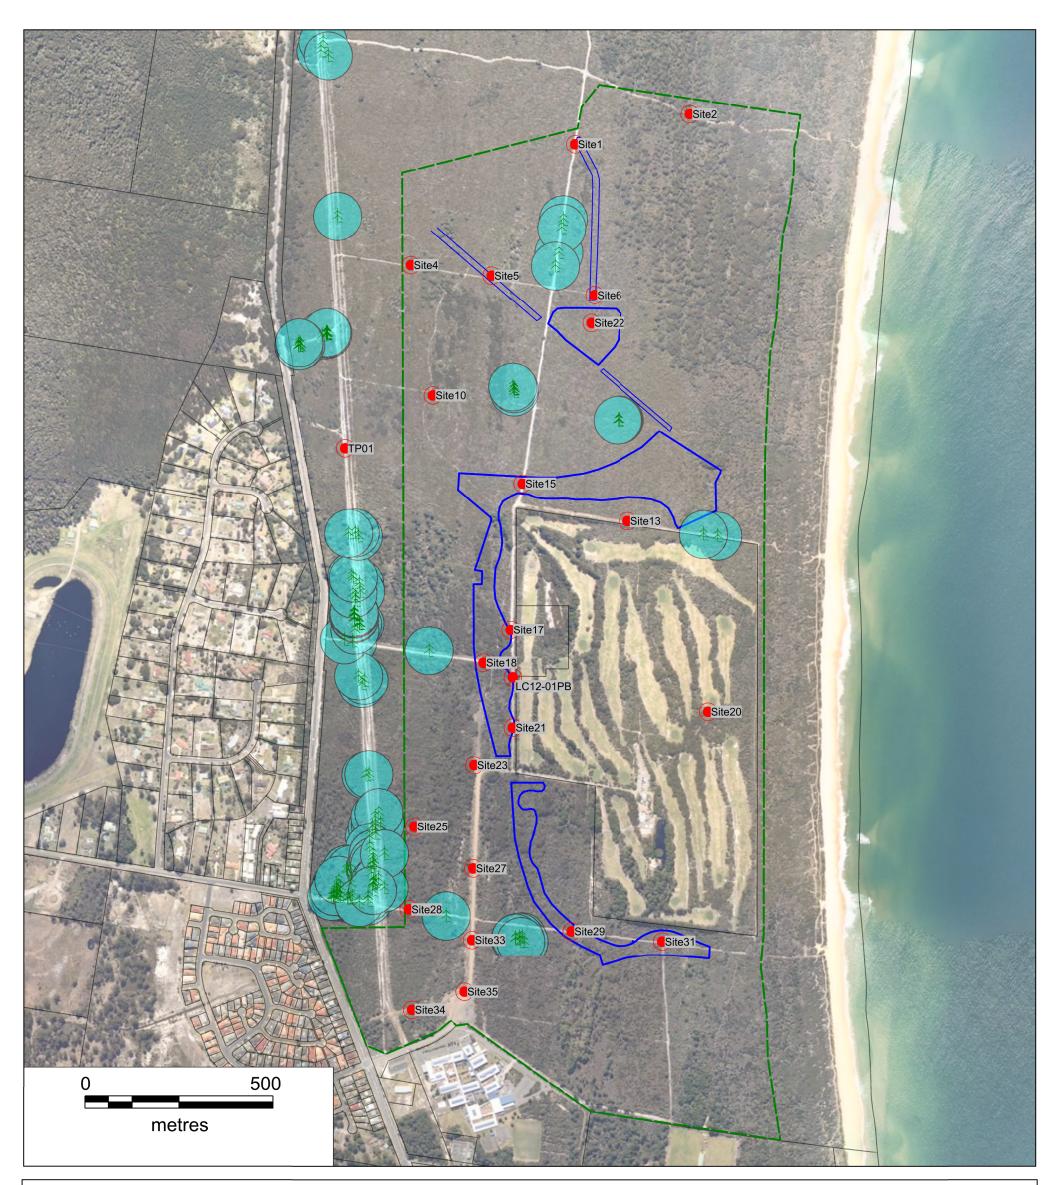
Bulk Earthworks Plan with Acid Sulfate Soil Testing Locations
